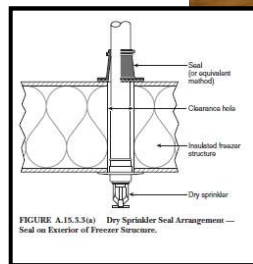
(a) Dry Sprinkler Seal Arrangement — Seal on Exterior of Freezer Structure.
